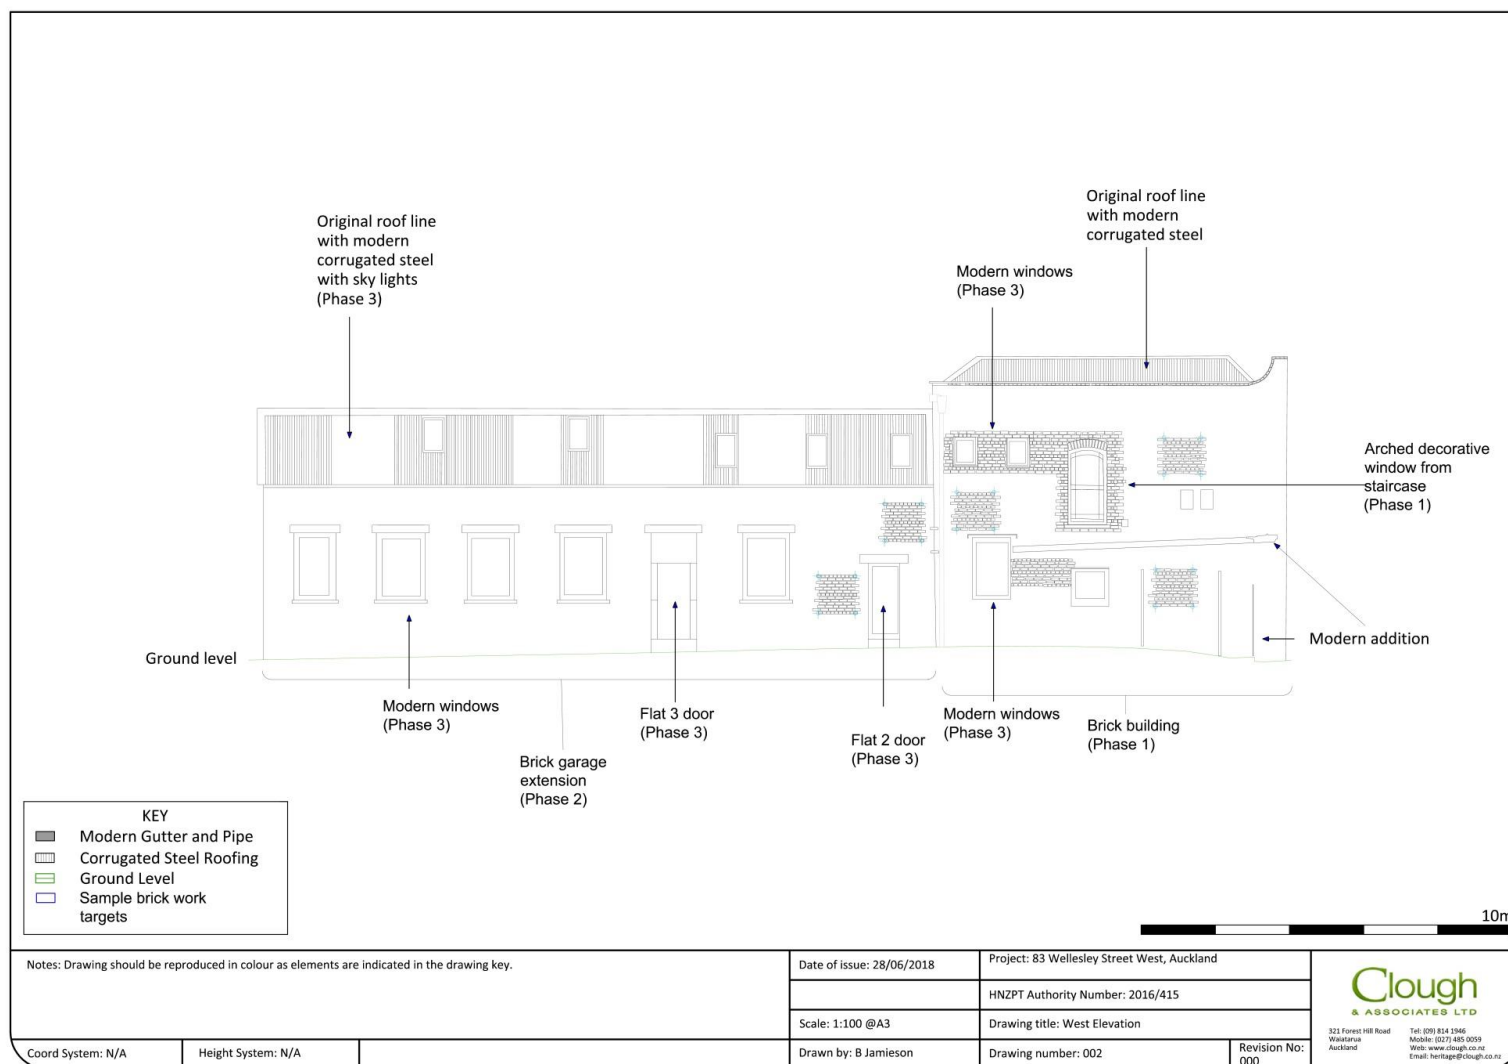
Side (west facing) elevation of 83 Wellesley Street West (source: Clough & Associates, 2015)
